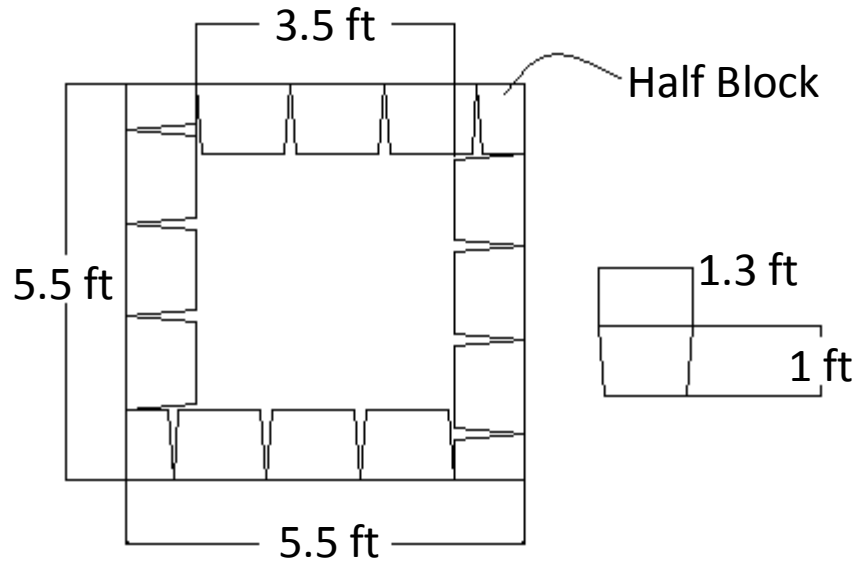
Illustration. Plan view of Vegas mini-pier experiment.
